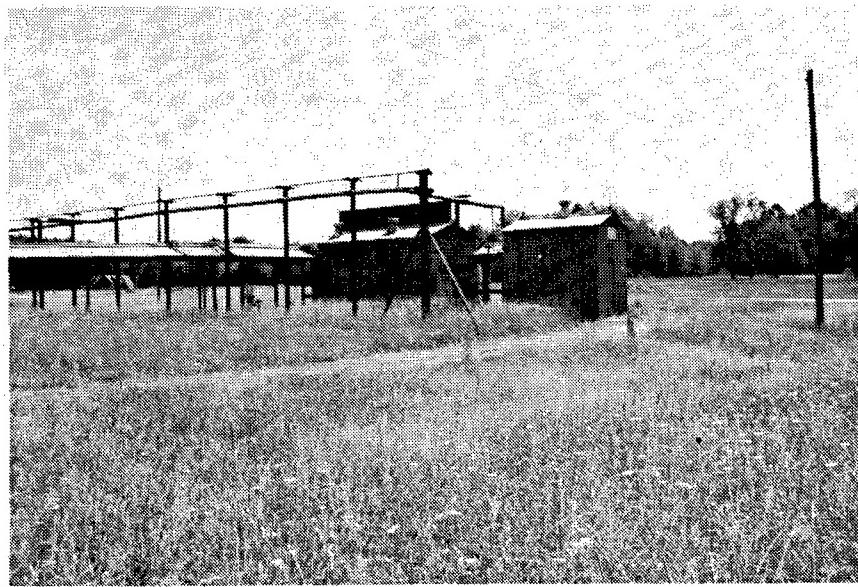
Building 2F-1 and Building 2F-2: Fulminate Dry House and Fulminate Heater House, respectively, both of which were located on Fuze Line #2.
